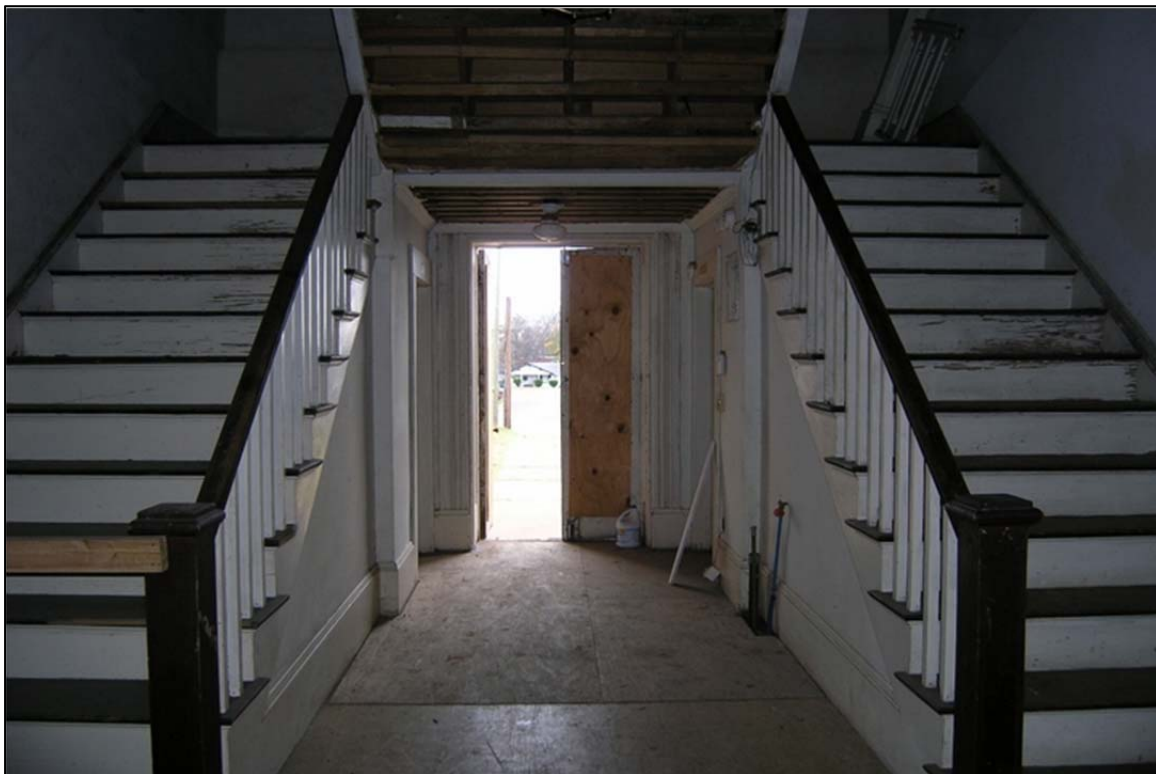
Stairwells looking out the south elevation frontispiece or back door.
